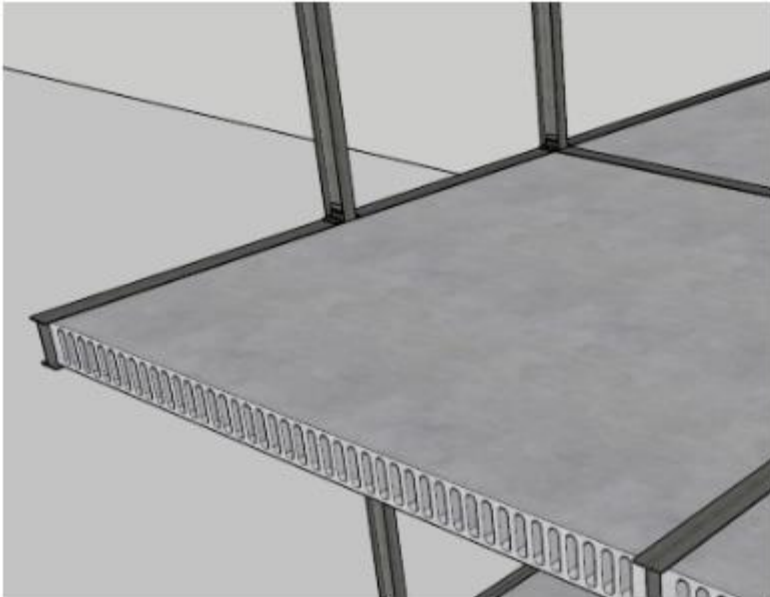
Section through 3D structural model showing pre-cast slabs being used in conjunction with steel column and beam structure.
